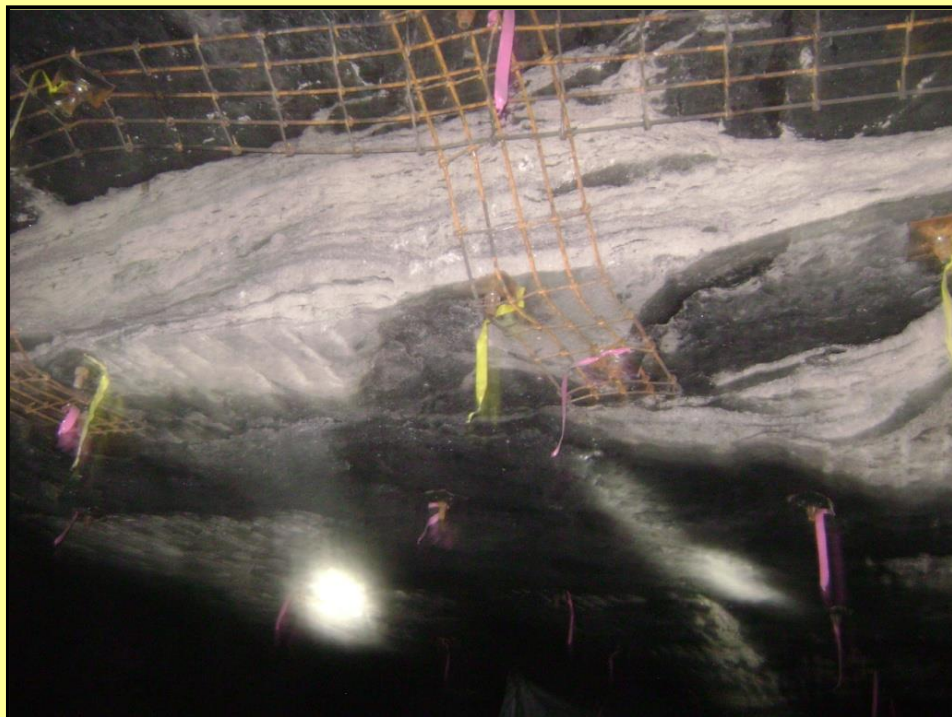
Picture showing the tension failure on one side of a guttering in the mudstone roof at Arnot and how it is re-supported by straps and roof bolts after guttering
